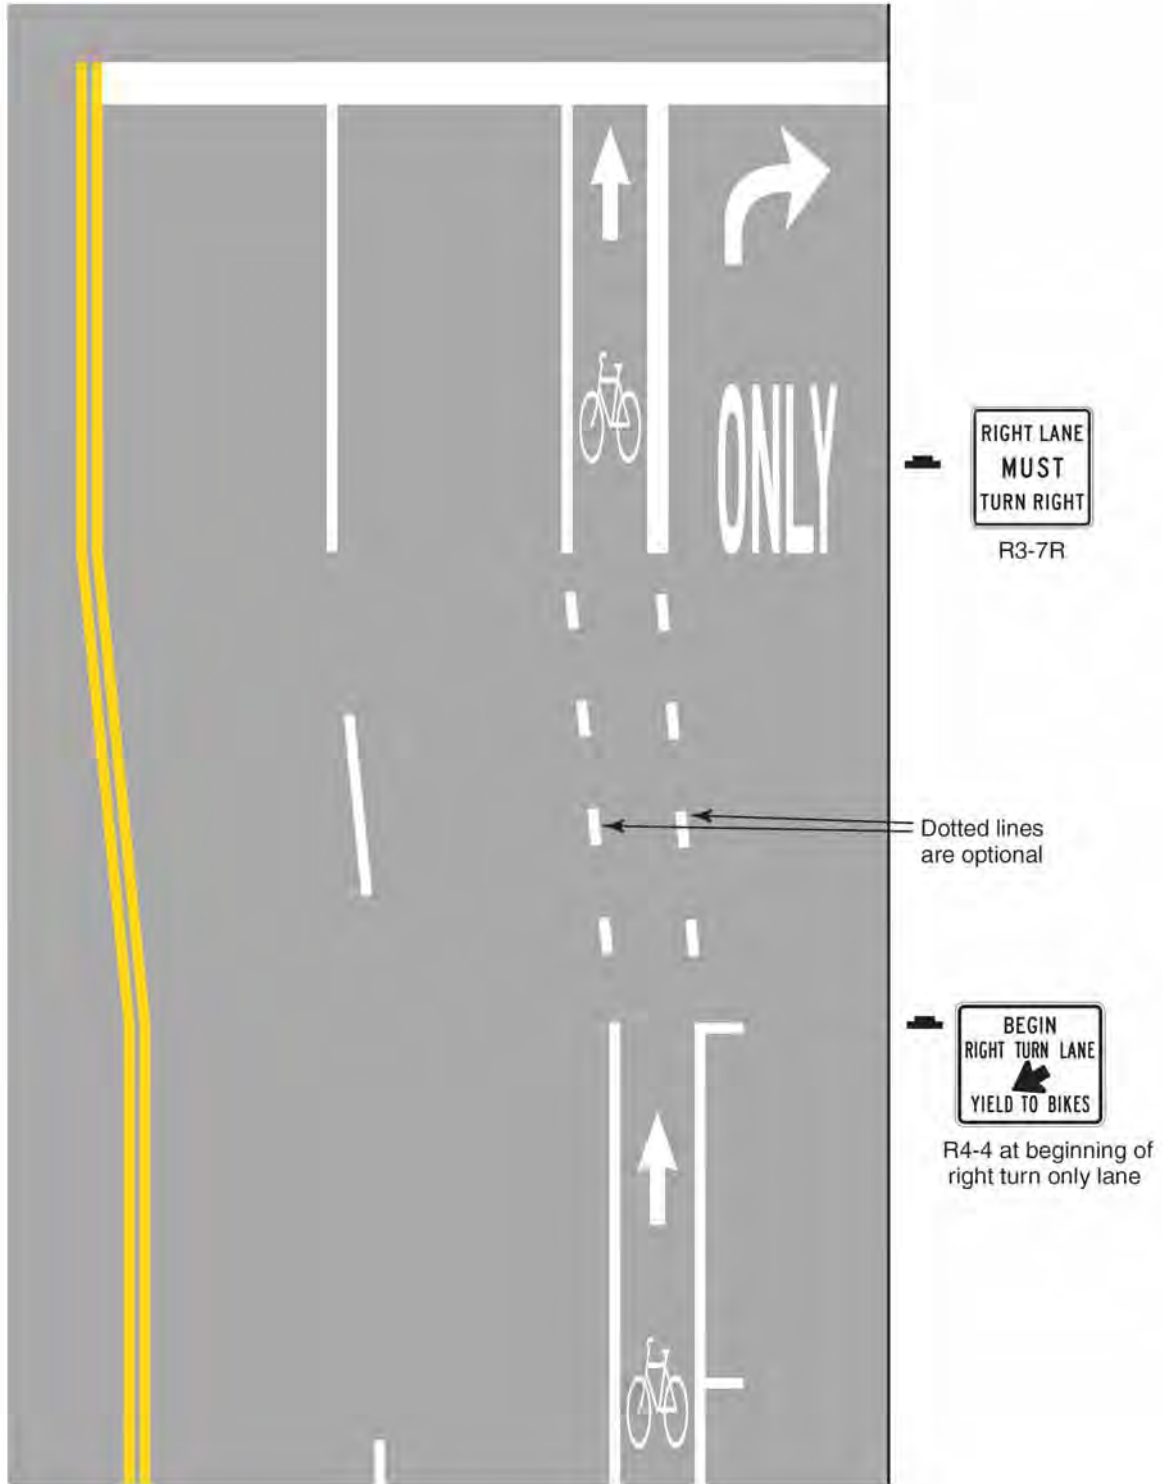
C-5. Example of Pavement Markings for Bicycle Lanes on a Two-Way Street
